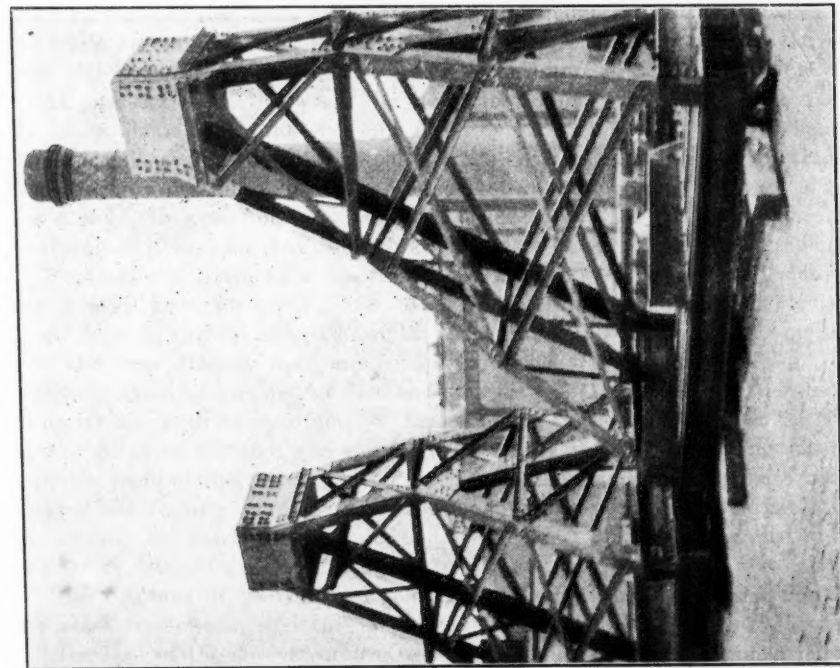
STEEL FOOTINGS BEFORE BEING ENCASED IN CONCRETE.
